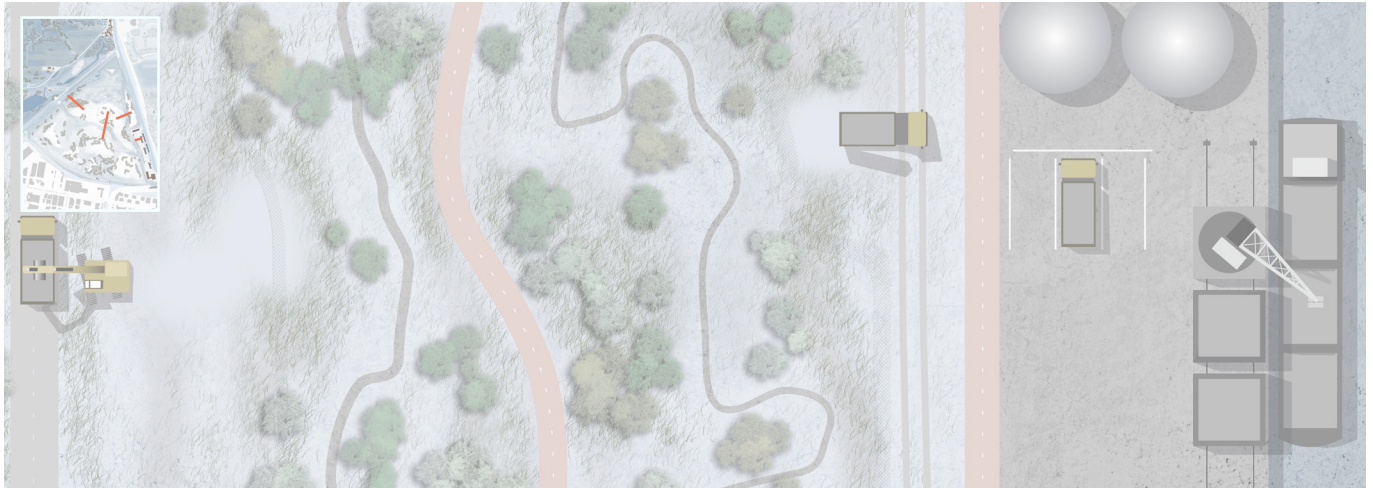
Zoom in on top view of waste collection hub (design part ONE)
